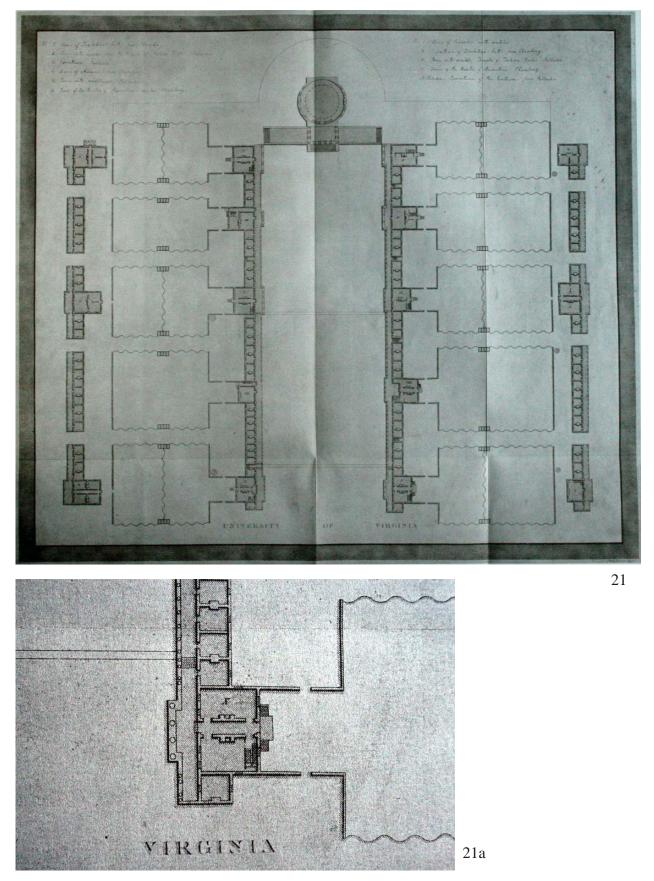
+ 21a. Plan of the University of Virginia and Detail of Pavilion X. Printed by Peter Maverick, 1825.
